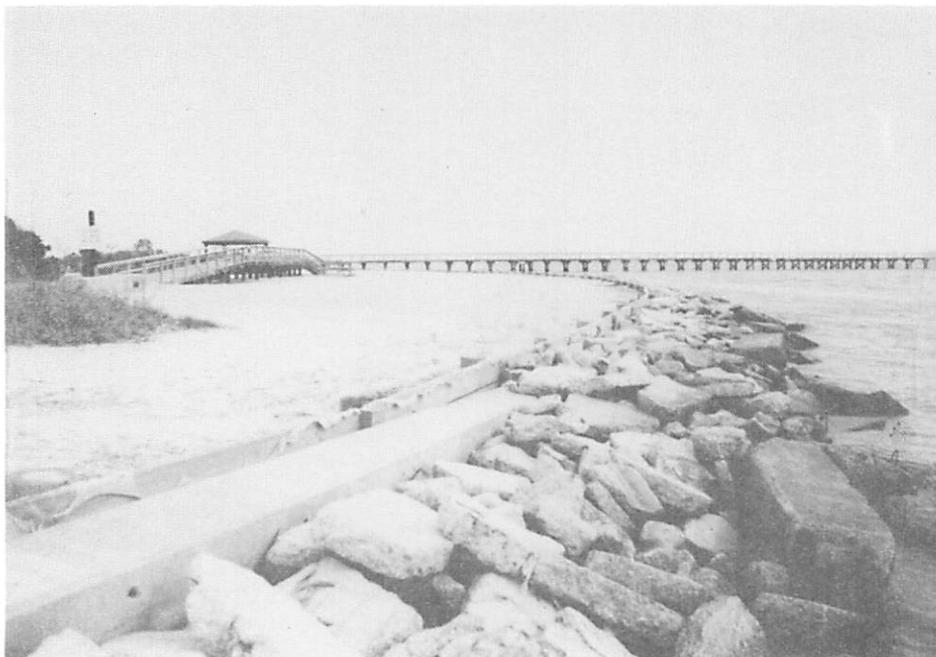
Park and pier area protected by riprap in the Pointe aux Chênes area.
